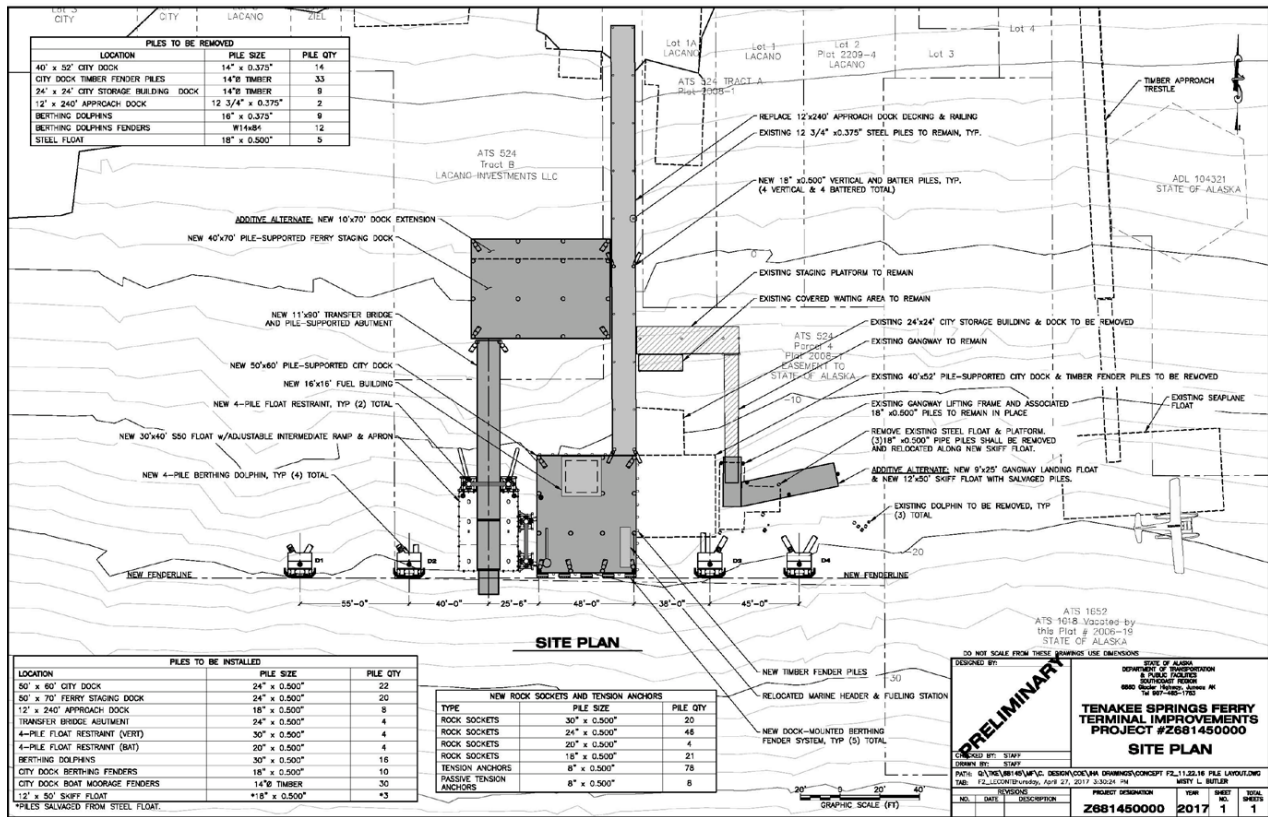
Tenakee Springs Ferry Terminal Improvements project site plan (HDR 2018a).
